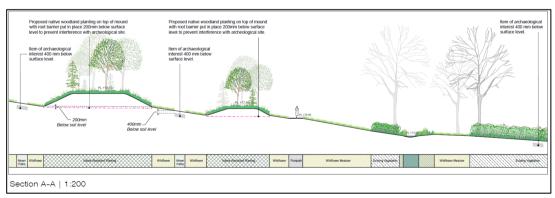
Section across proposed planting showing depth of root barrier and archaeology (see Appendix 11.G)
